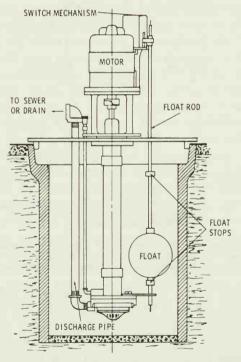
A typical drainage-pump installation, with float control. A standard sewer pipe can be used to provide a suitable drainage sump.
